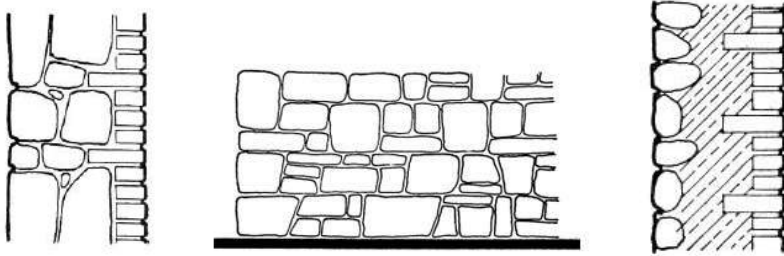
Some examples of masonry walls: EW-SB; EW-S and EW-SCB
